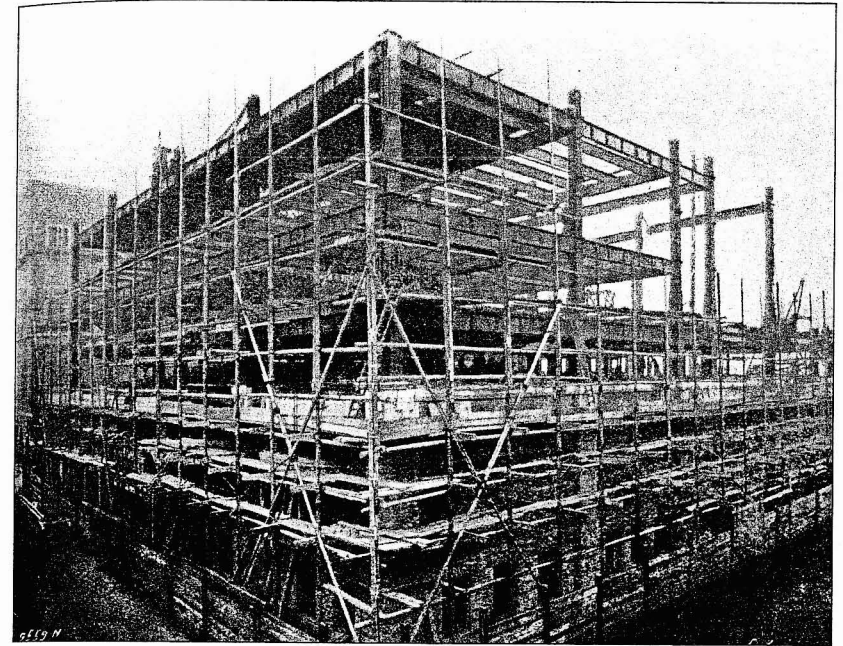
The Market Street Store, Guinness Brewery, Dublin (1904). The building during erection, showing stanchions in the two external walls, and the steel frame constructed ahead of the masonry cladding (Sir William Arrol Ltd., *Bridges, Structural Steelwork and Mechanical Engineering Productions*, 1909).
